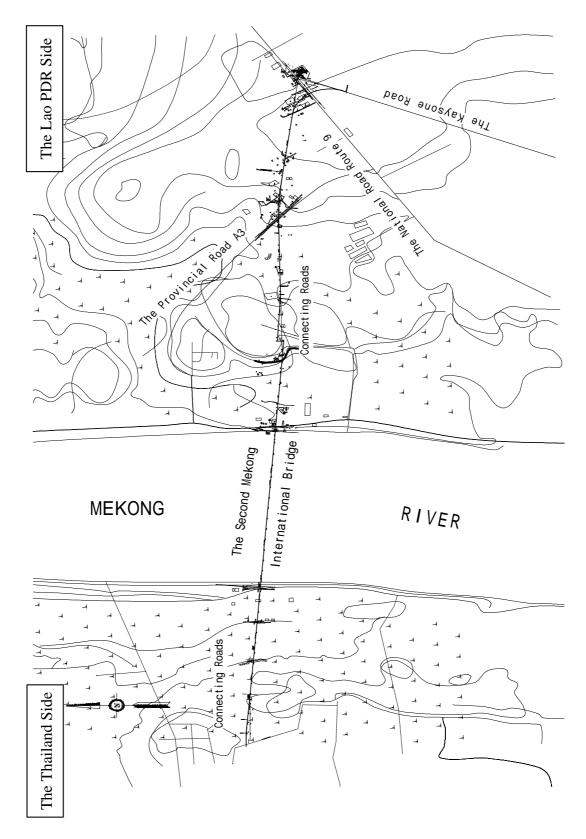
Horizontal Alignment of the Bridge and Connecting Road
